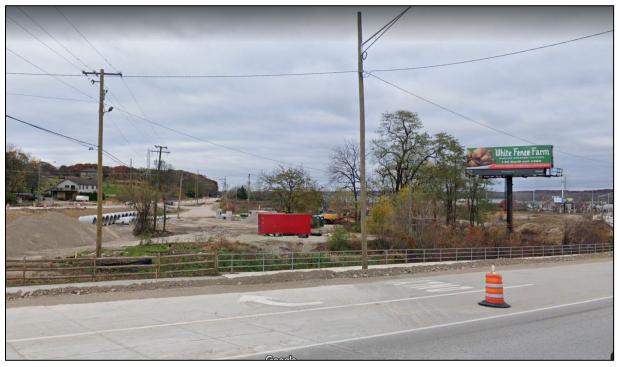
Looking west from Archer Avenue at the intersection of Route 83 & Main Street
